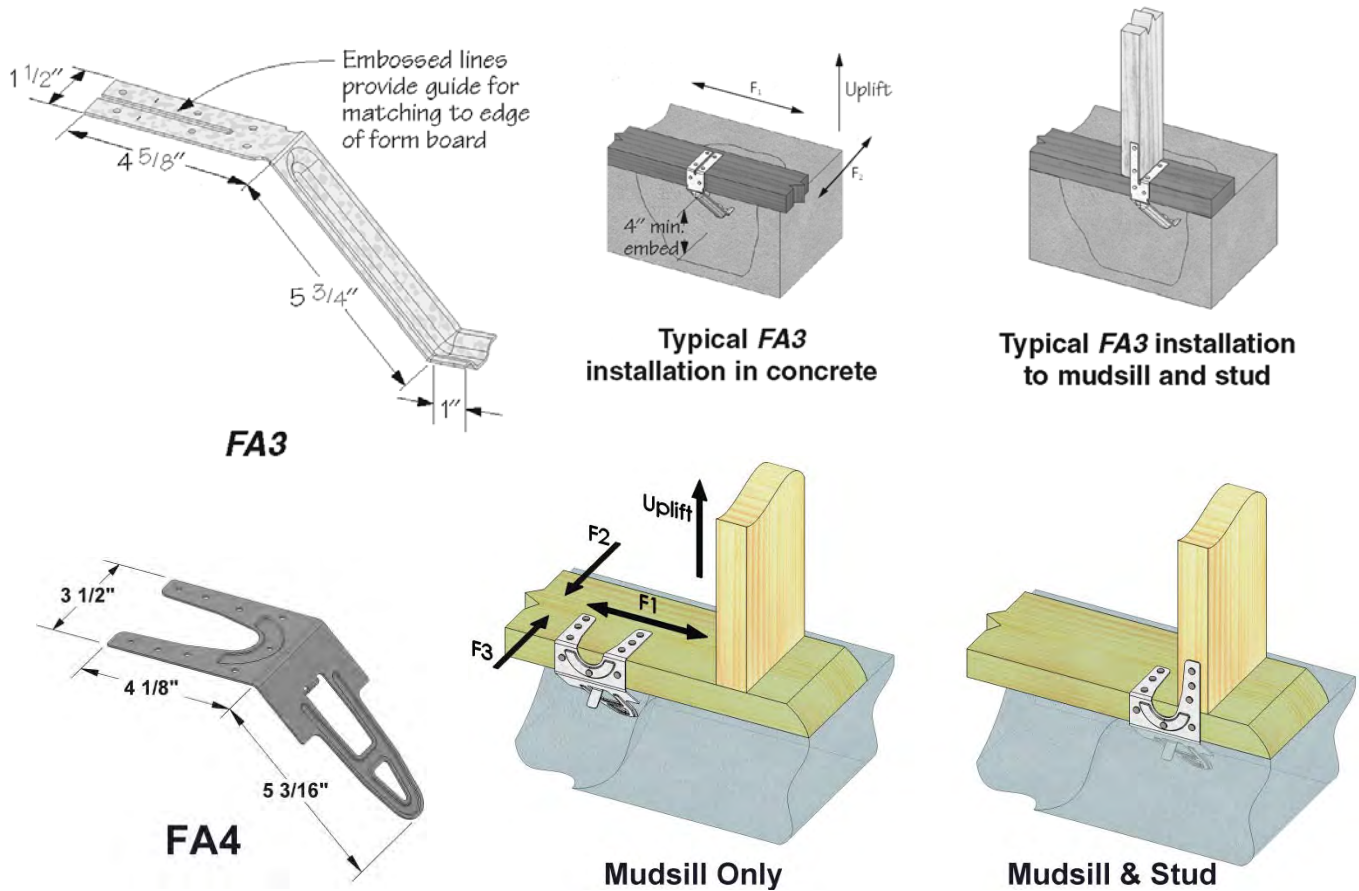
FA3 AND FA4 FOUNDATION ANCHORS
